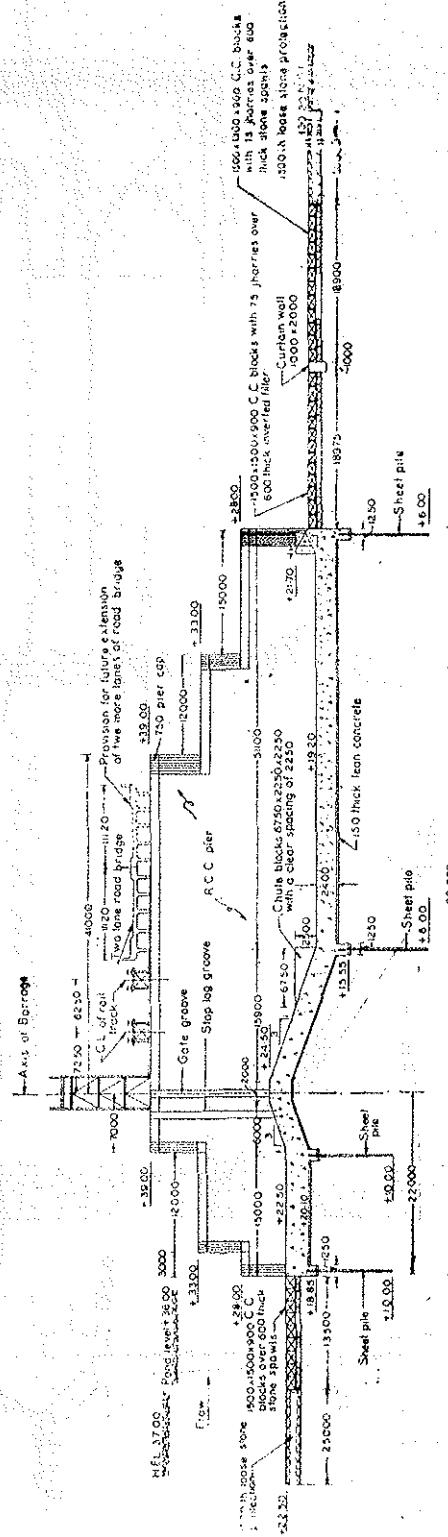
Typical Section of Spillway of Barrage.
